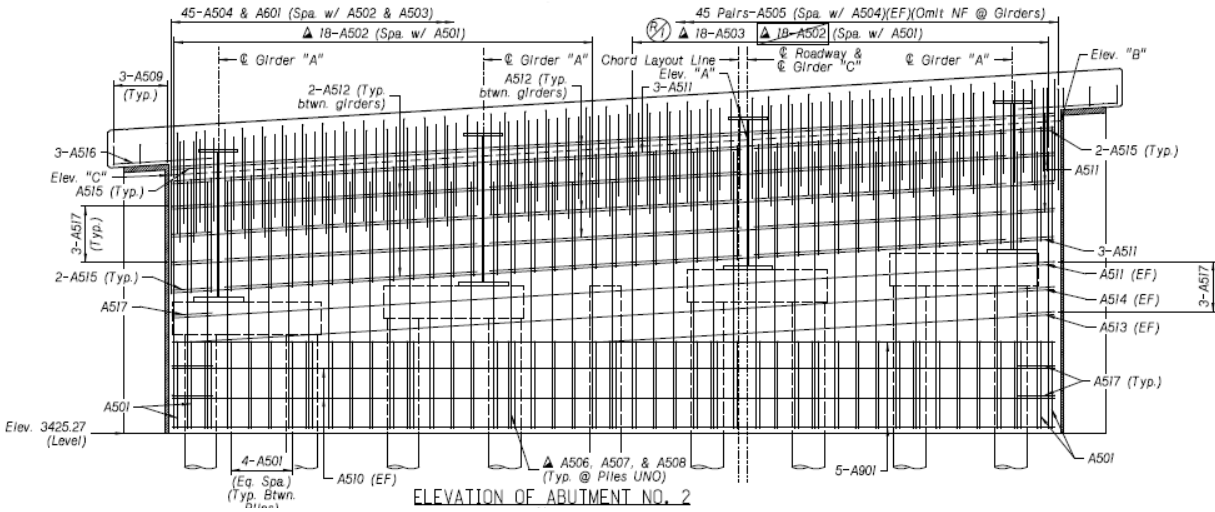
Elevation View of the Abutments (drawings retrieved from Big Springs West I-80 Loop Bridge)
